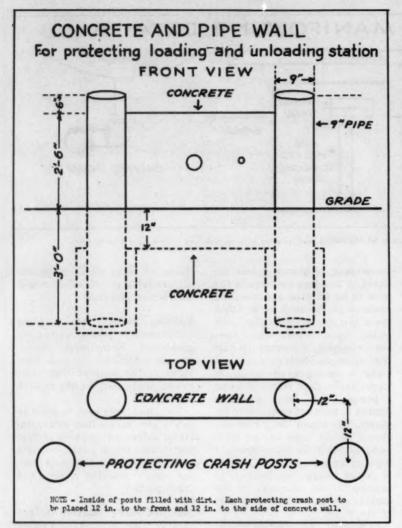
This type of concrete wall or bulkhead should be installed to protect every loading and unloading pipe, whether it's for liquid or vapor. The wall, itself, should be protected with crash posts. Note how easily the wall can be constructed by merely filling in the space between two dirt filled 9 in. diameter steel pipes, each & ft long. Note also the centered liquid pipe hole and adjacent vapor pipe outlet. Piping details of this station are shown on the opposite page.
